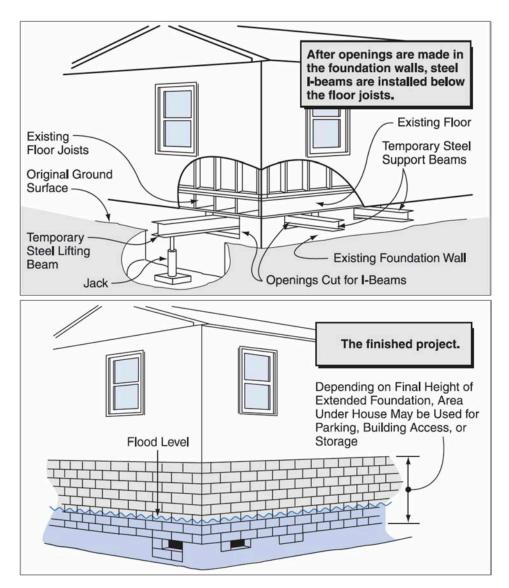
Elevating a basement foundation home on extended foundation walls (FEMA, 2009)
